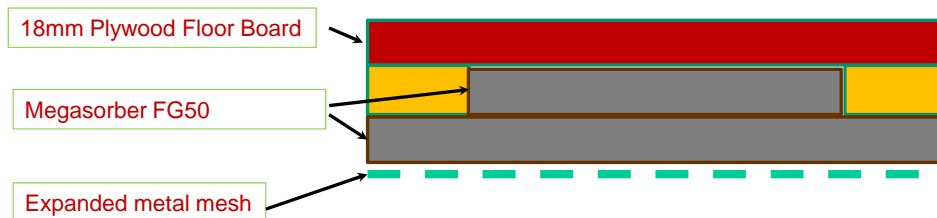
A schematic drawing of Megasorber FG50 installed under the floor board
